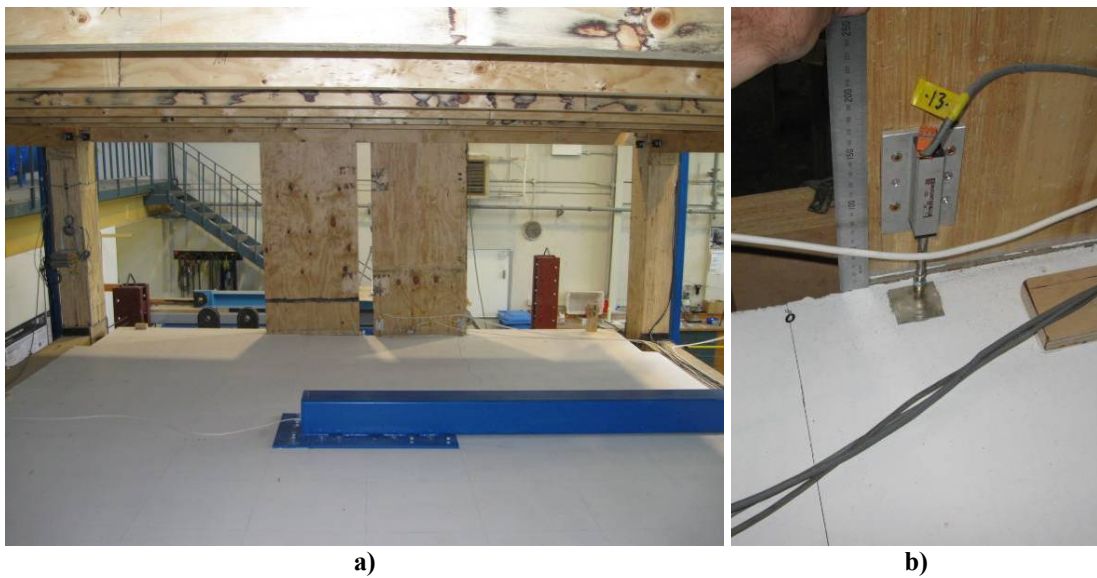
Wall at 2.0% Drift a) West walls b) Wall rotation relative to slab
